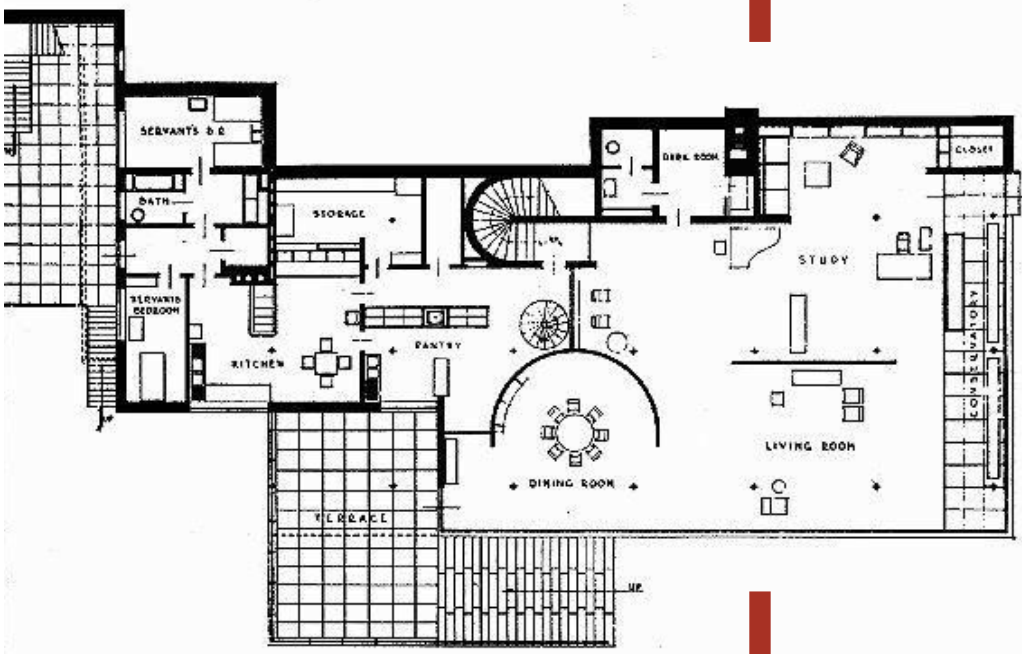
Floorplan second floor Tugendhat. From "Archigraphie," 2011.
